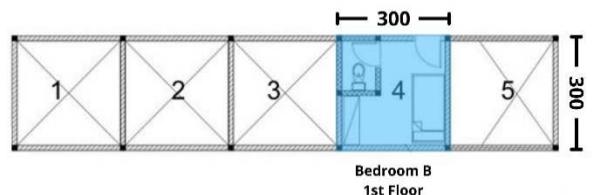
Layout plan of Bedroom B and its location in the first floor
